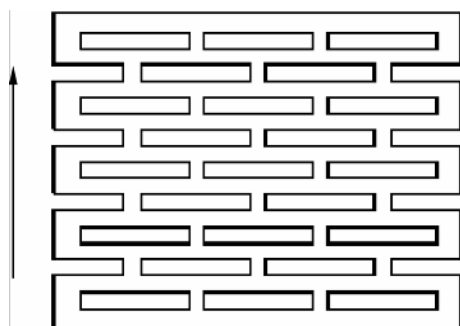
Lightweight concrete masonry units — Geometry 3/1,2
